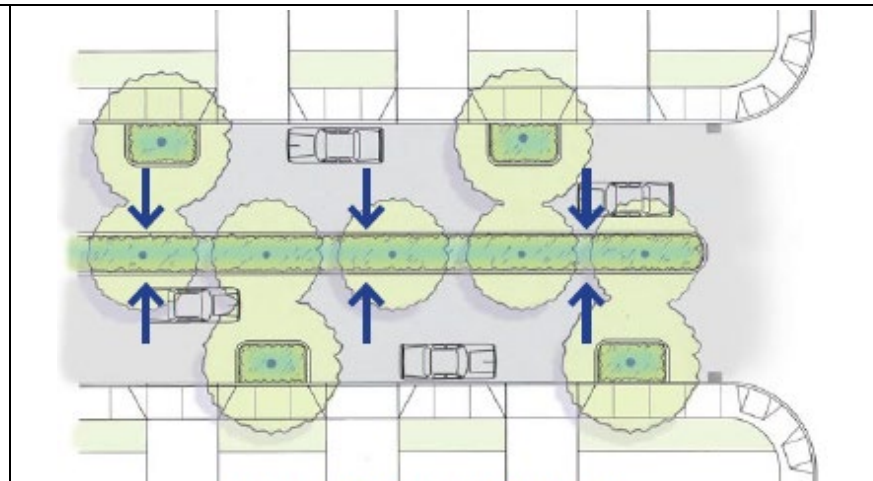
Reverse Crowned Street Profile. A reversed crowned street is the opposite of a crowned street and directs runoff to the center line of the street. GI facilities may be considered in the median.
